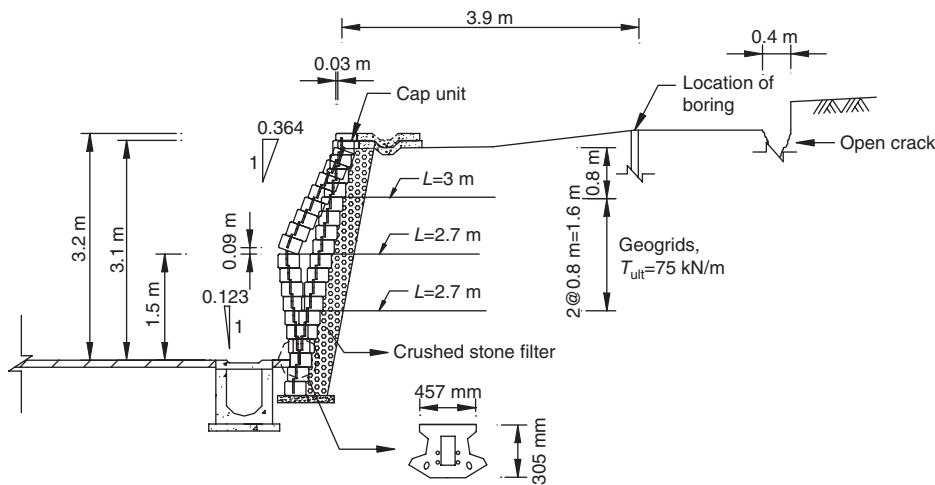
(b). Severely deformed section of the GRS-MB wall adjacent to the failed wall at site 2
